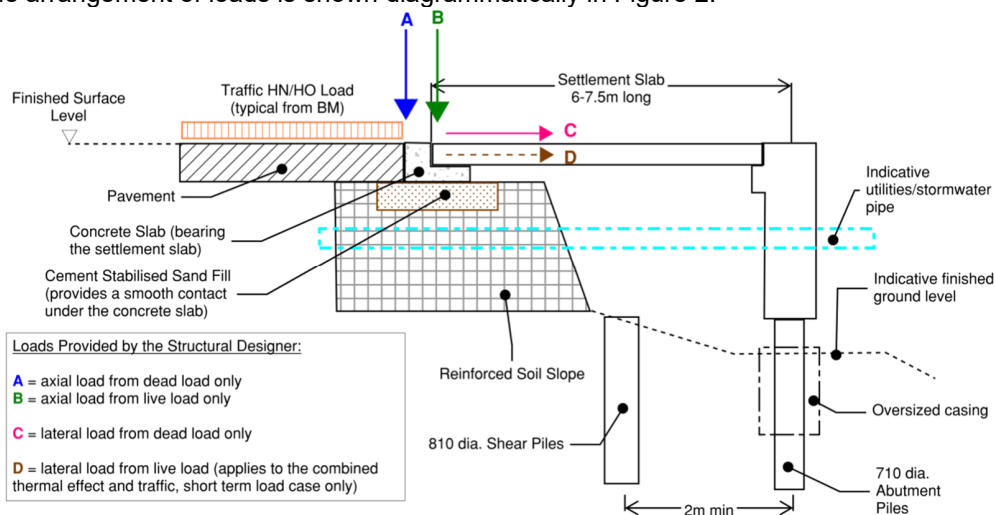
Typical abutment arrangement and settlement slab loads (shown diagrammatically)
